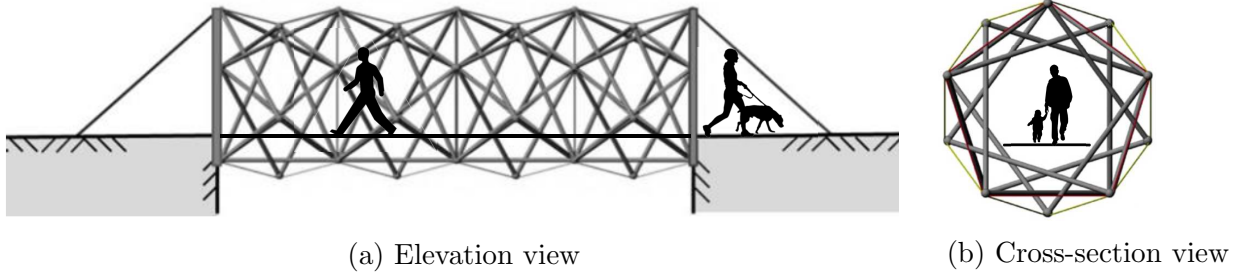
Elevation view (a) and cross-section view (b) of a "hollow-rope" tensegrity foot-bridge
